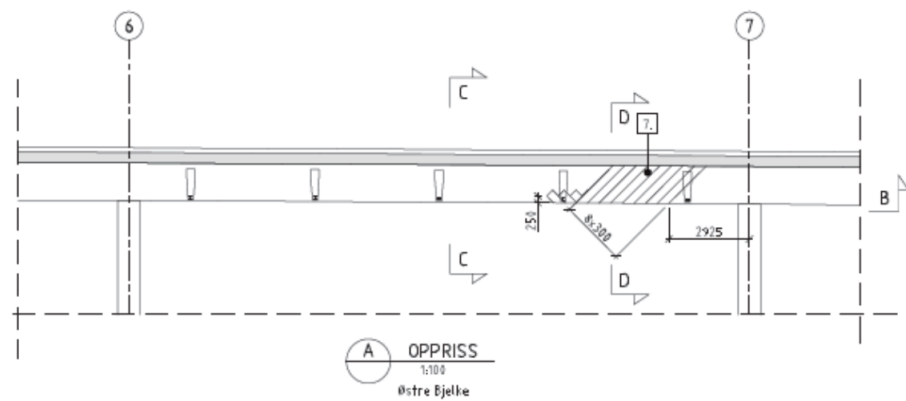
Details of CFRP reinforcement from the side of the beam [34]
